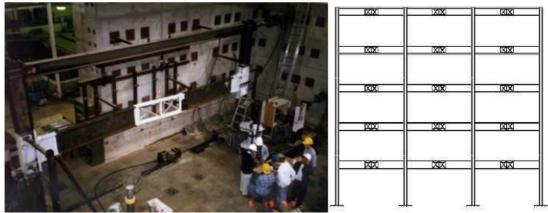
Frame modified with mid-span truss opening [Leelataviwat et al., 1998]
